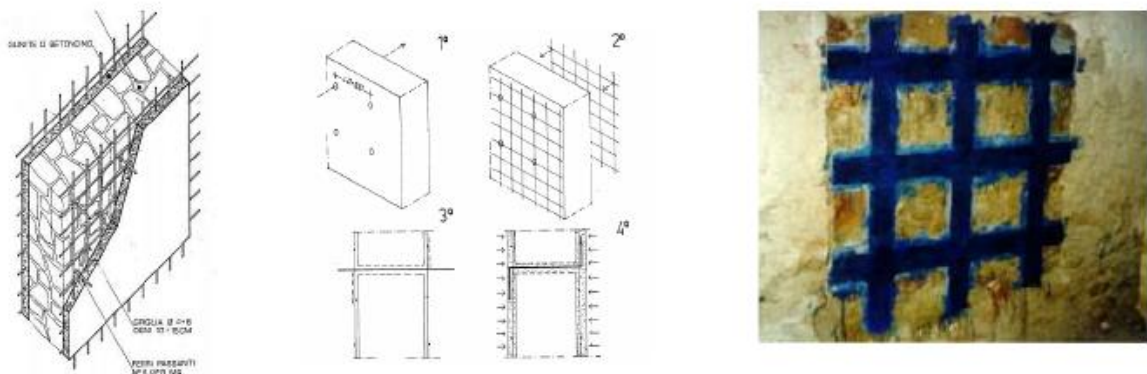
Increase the shear strength: a) b) Wall and pier jacketing, c) Wall and pier jacketing with FRP strips.
